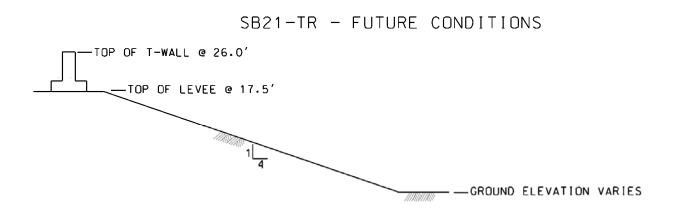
Typical Levee Design Cross-section Transition Reach Levee/Floodwall Combination (SB21-TR) Future Conditions
